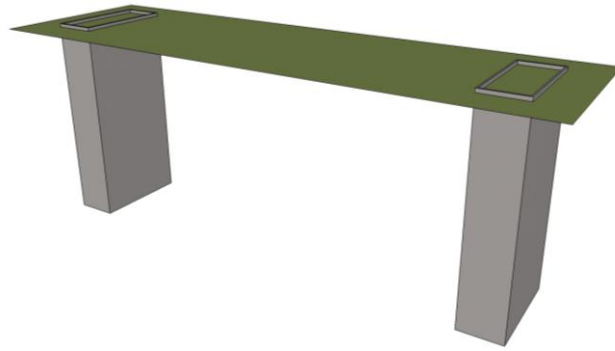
Installing diaphragm walls for two entrance shafts
